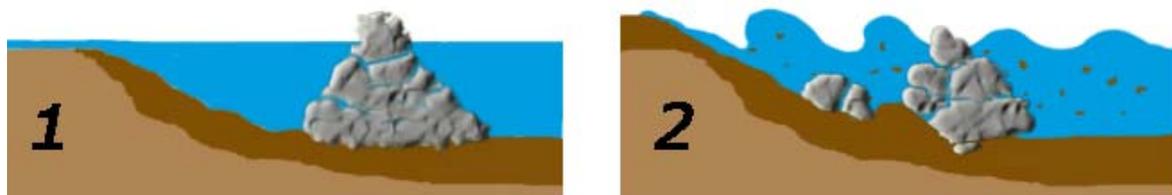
Schematic section of the proposed breakwater/sea-wall (1) and possible failure (2)
